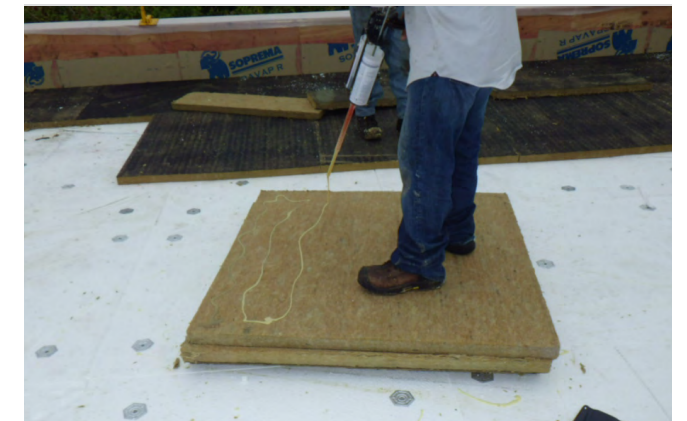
A roof assembly with a fastened-adhered hybrid attachment system. The first layer of insulation is mechanically fastened, but subsequent insulation layers are adhered. The fasteners are installed through the membrane, which acts as the construction phase moisture protection and the permanent air and vapor barrier.
